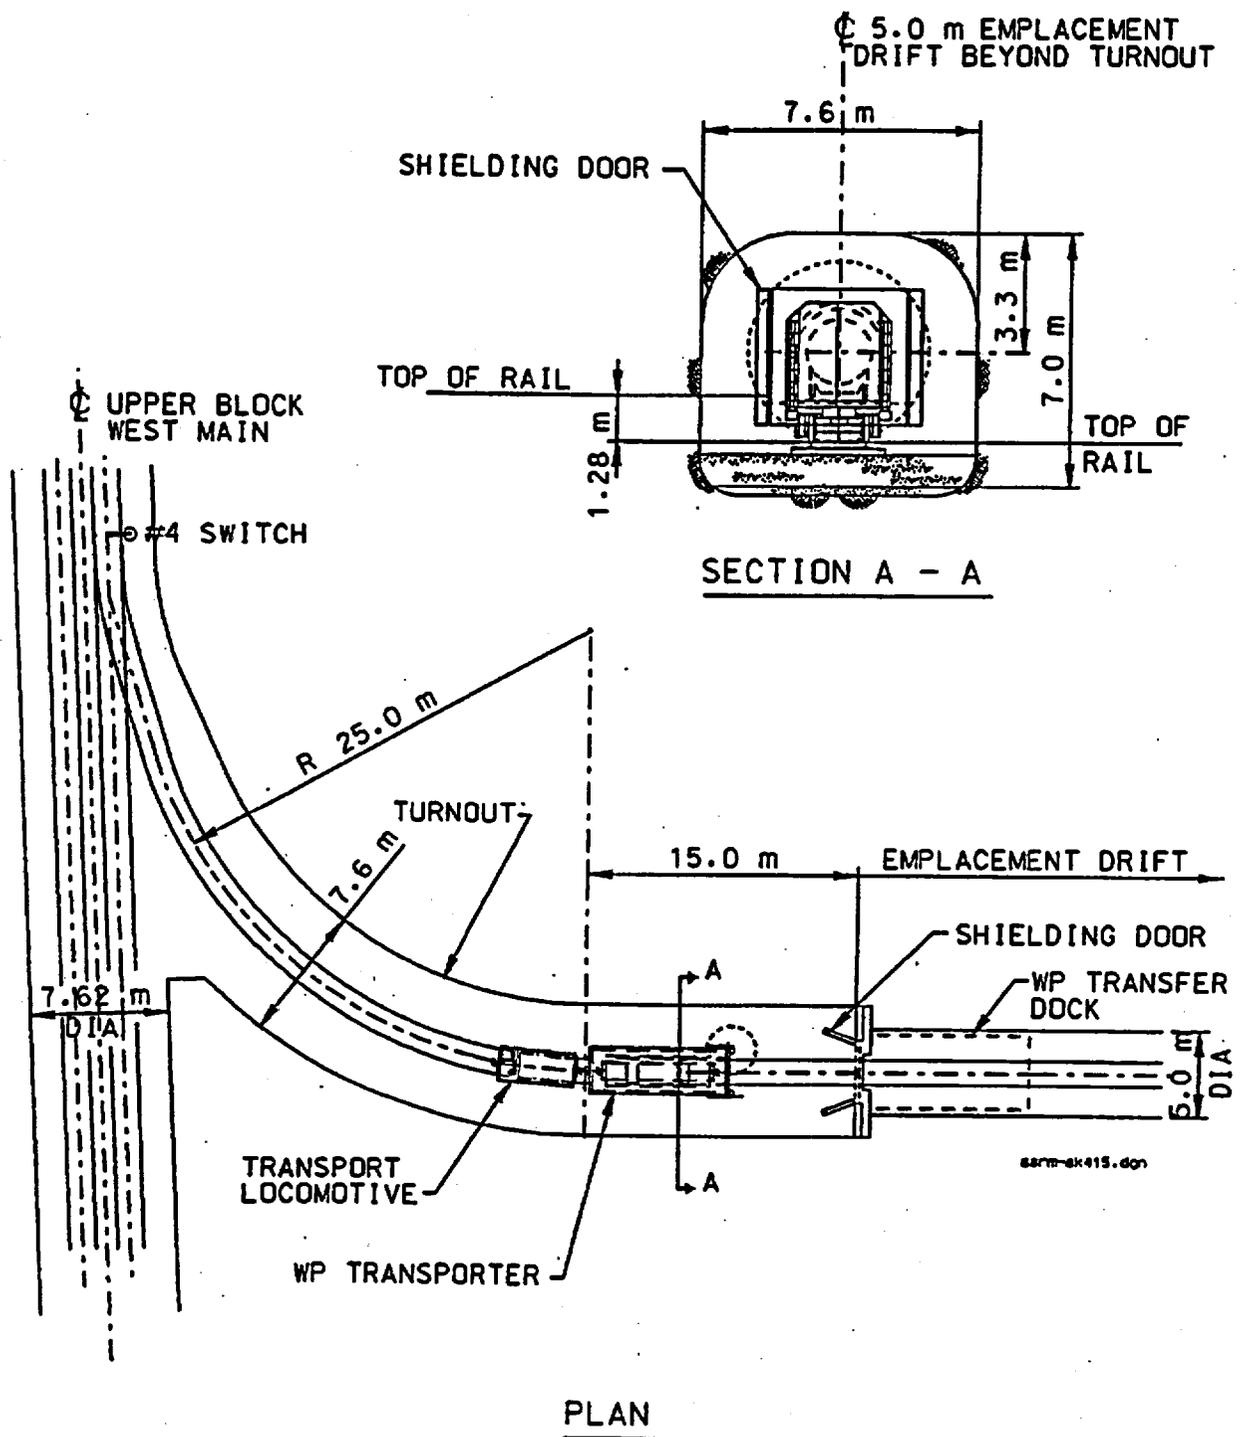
Typical Track and Switch Layout at Upper Block West Side Emplacement Drift Entrance
